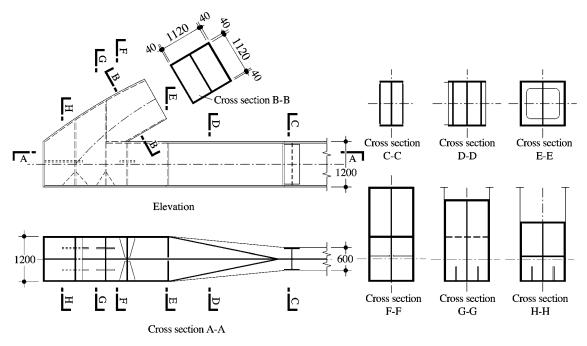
Example of the joint between a cross girder and a lateral beam.
